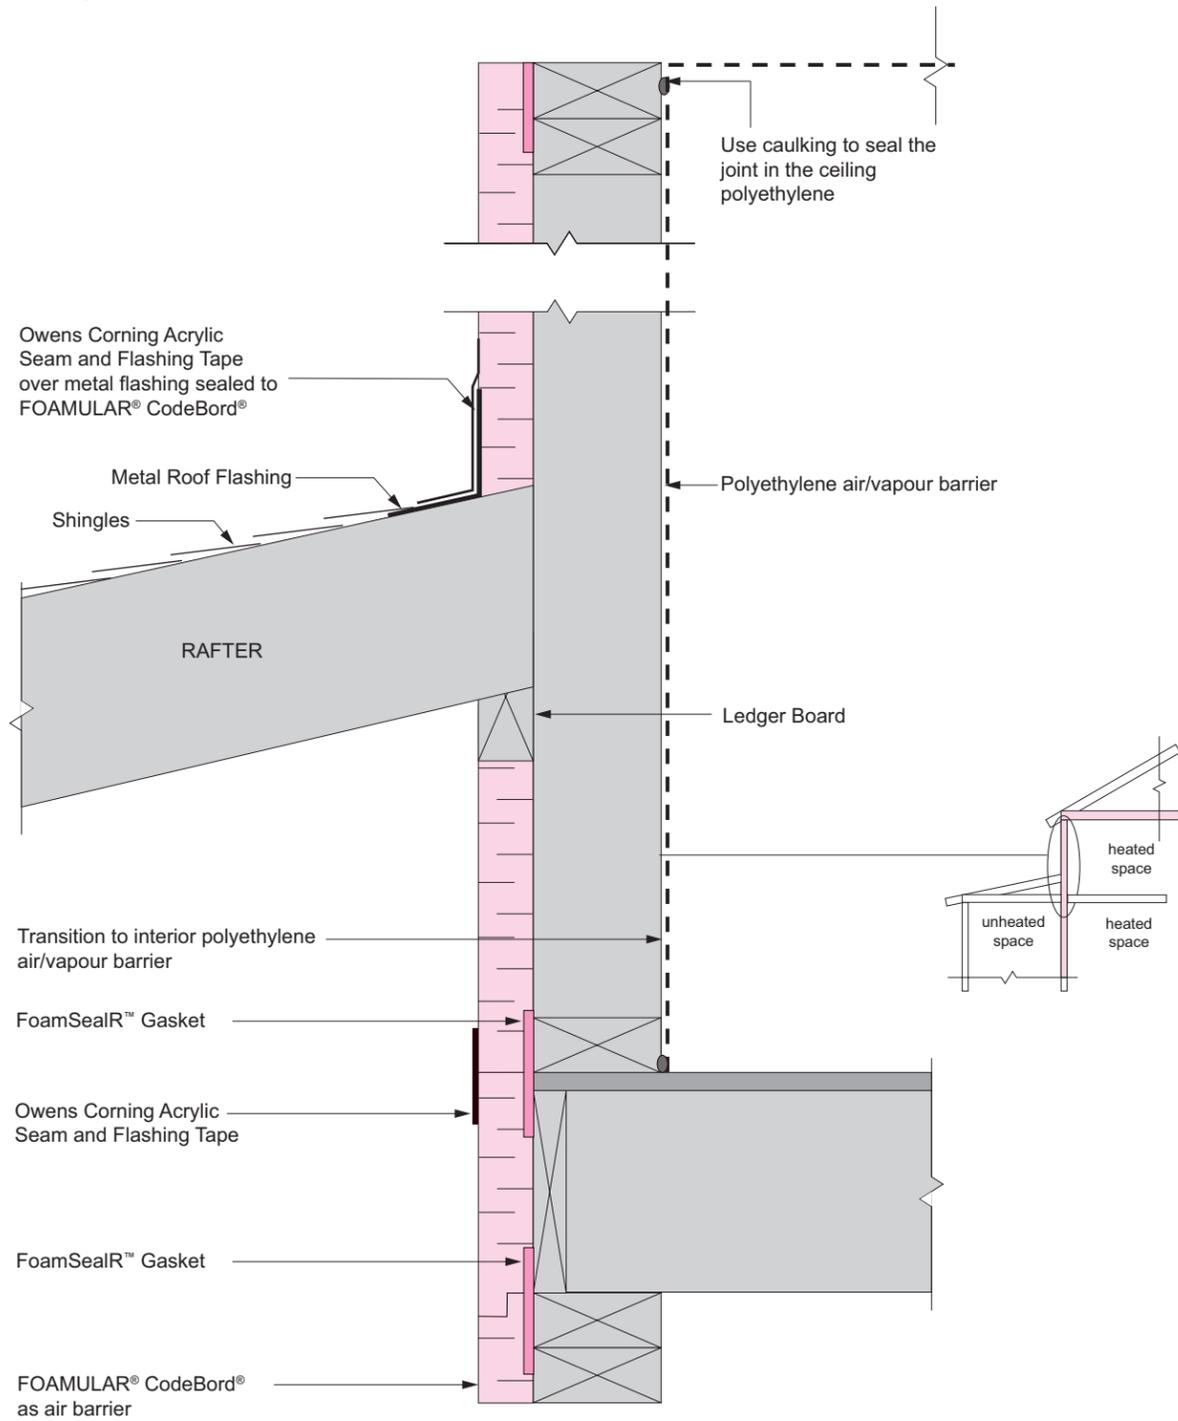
Exterior Walls Projecting Past Attached Structure (Shingle Flashing Detail Option A)
